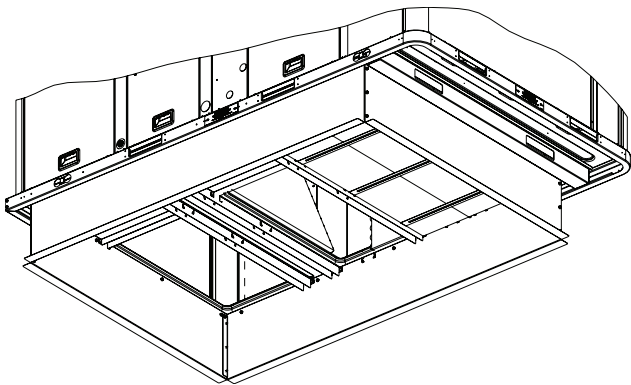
View for base to roof curb alignment on C.0 cabinet on a 60" x 84" roof curb
